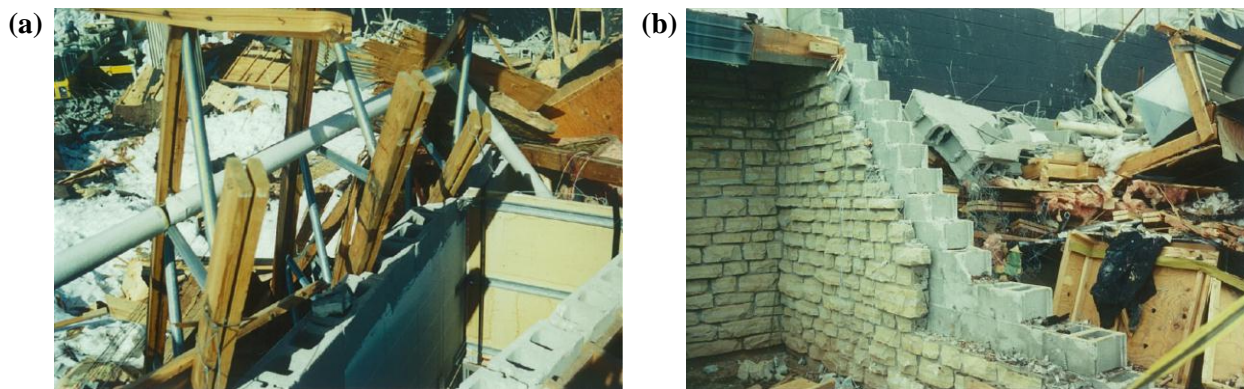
(a) Open-web joists and (b) masonry wall after failure (J.R. Harris & Co. 2011).
